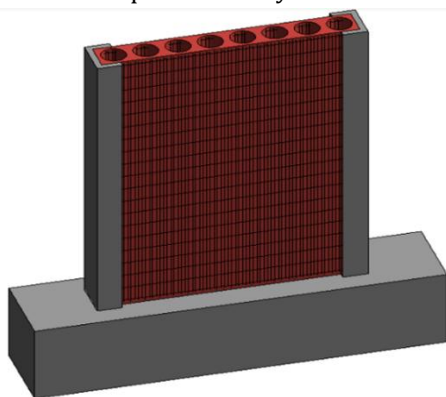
CFRP two-way Hollow core shear wall with Channel shaped boundary elements
